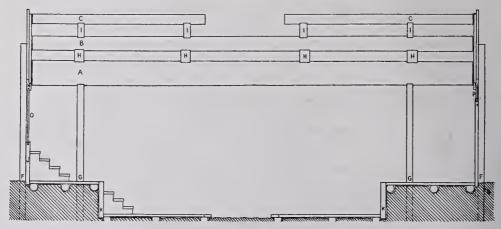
Longitudinal section, showing construction of dwelling house.
